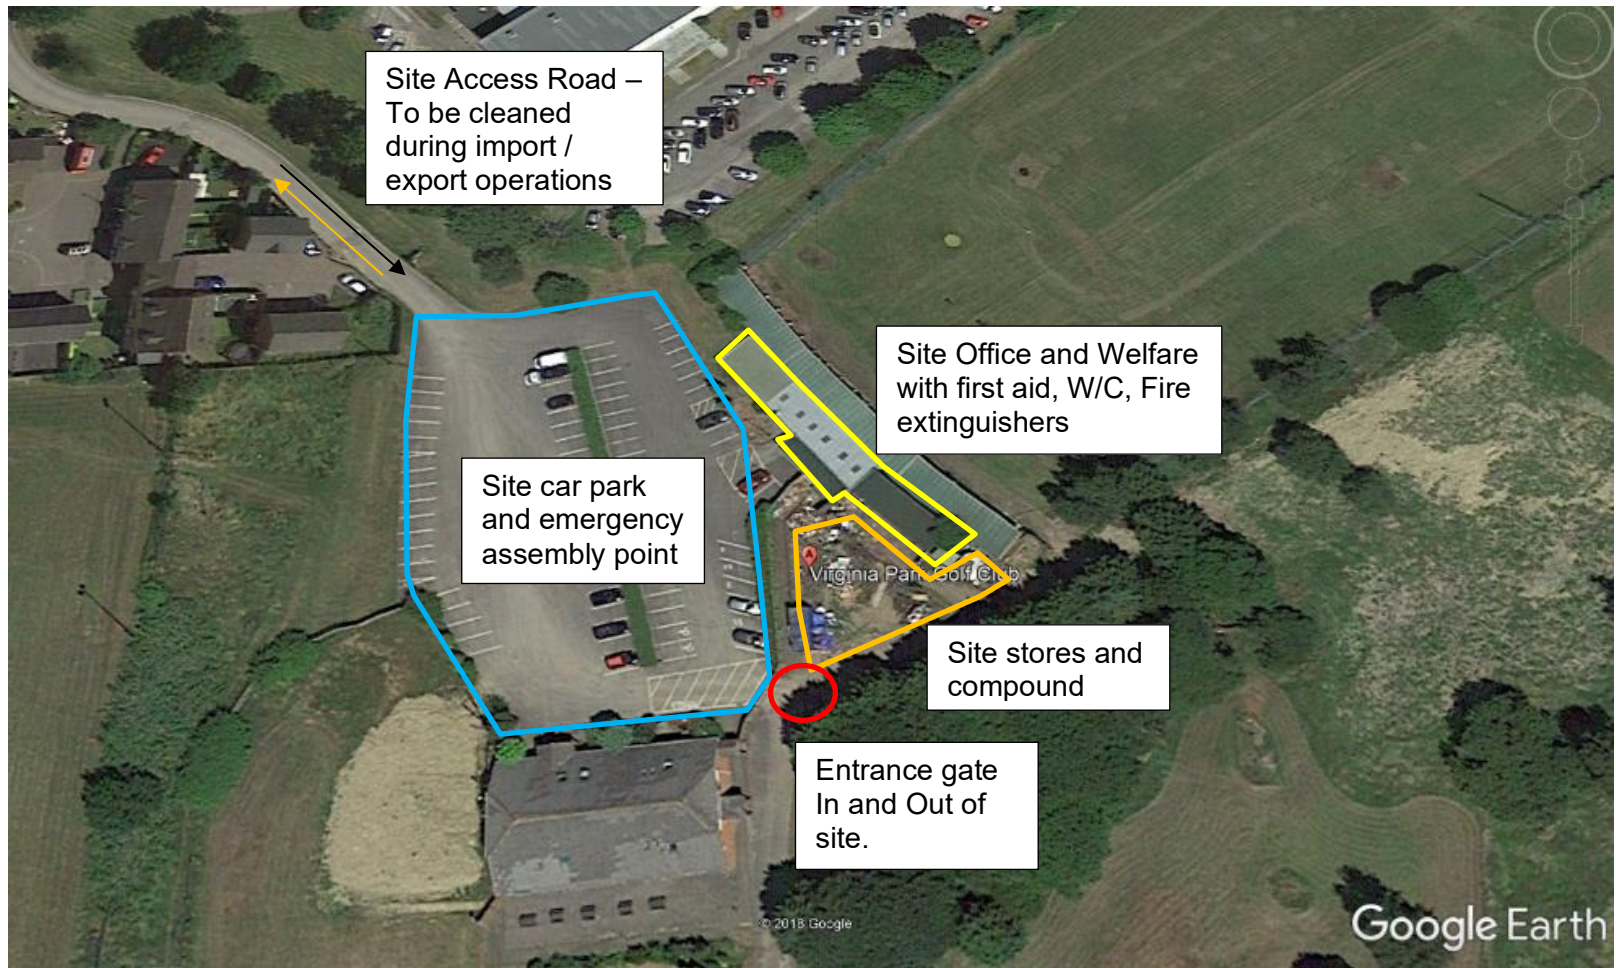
Detailed plan of the site compound, parking and access arrangements.
